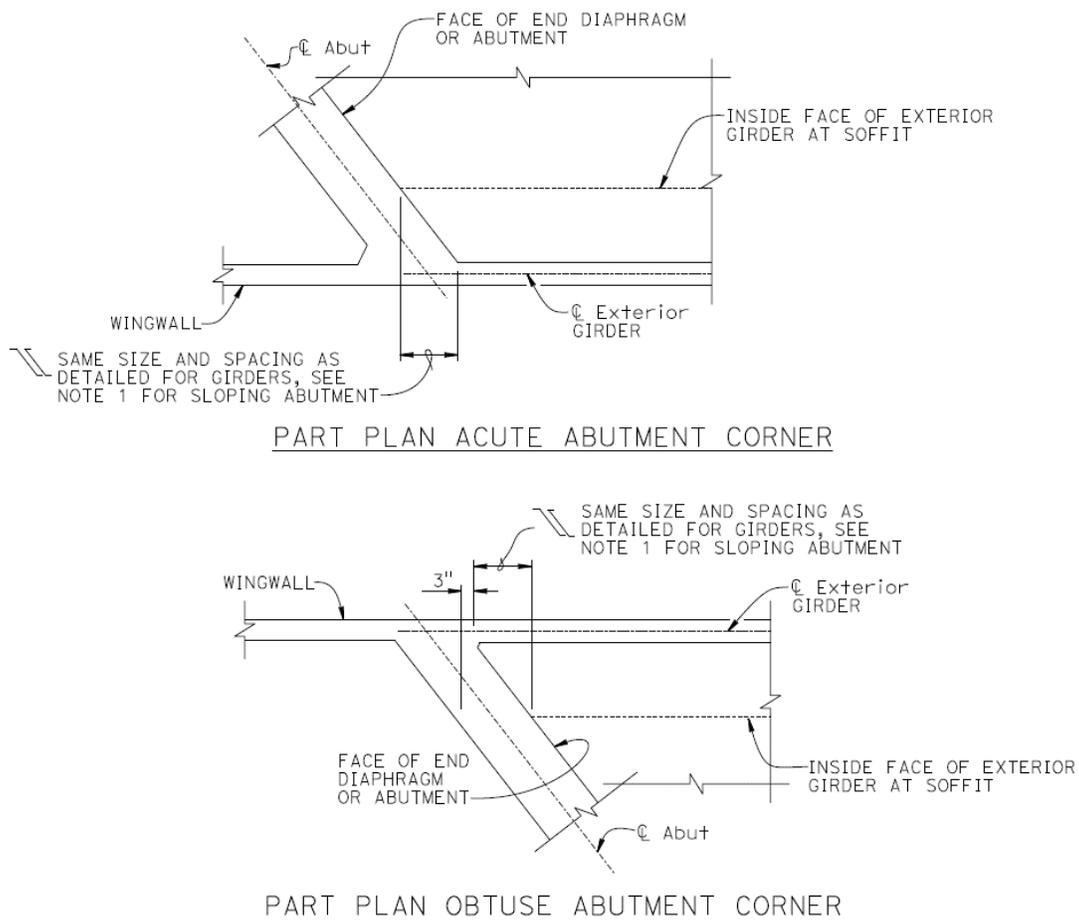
Stirrup Reinforcement at Abutments (Sloping Exterior Girder)
